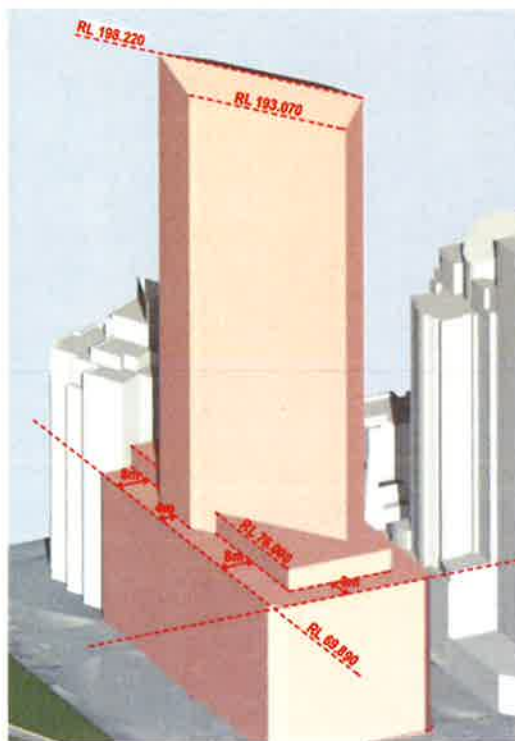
| Approved building envelope at 201 Elizabeth Street (Source: Approved Plans, SSD 8105)
